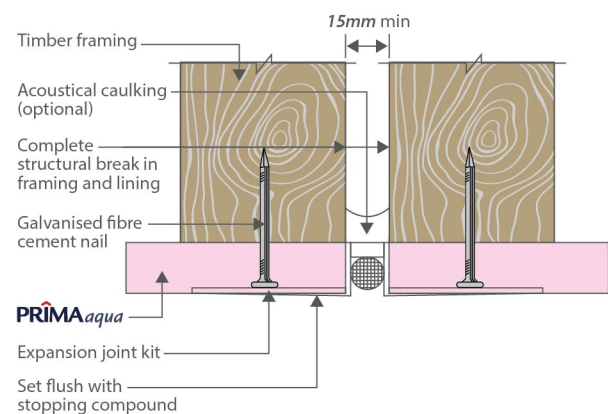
Movement Joint Detail (Untiled Wall and Ceiling)
